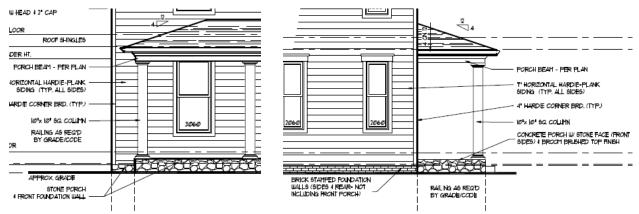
Detail of the front left corner of the house, showing the absence of a transition between the stone foundation on the façade and the stamped brick on the side elevation.
